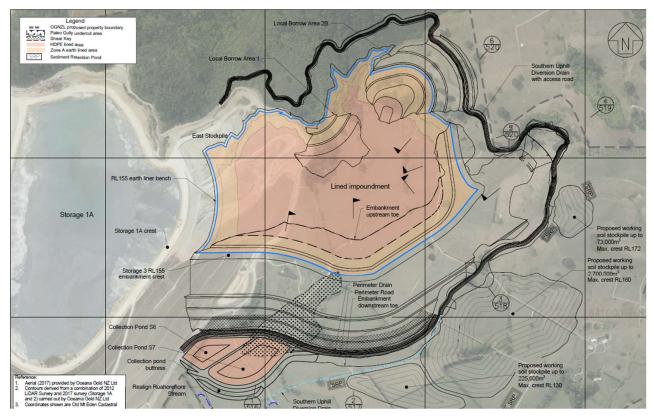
Proposed TSF3 Collection Pond (EGL, 2025b)
